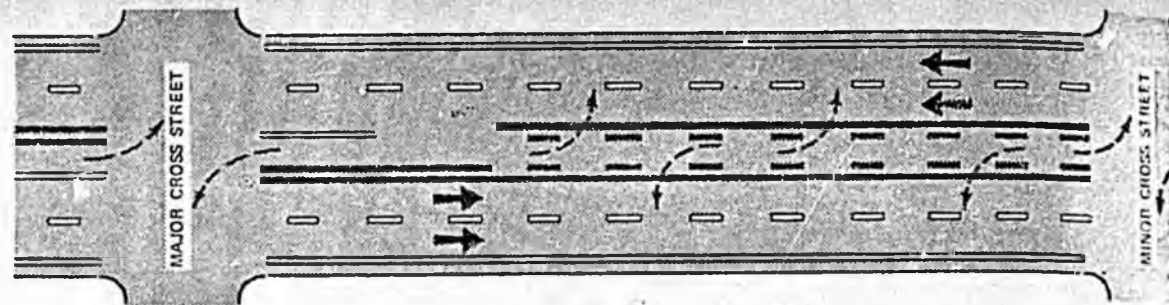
Recommended pavement marking for two-way left turn lanes. (From Ref. 18)
